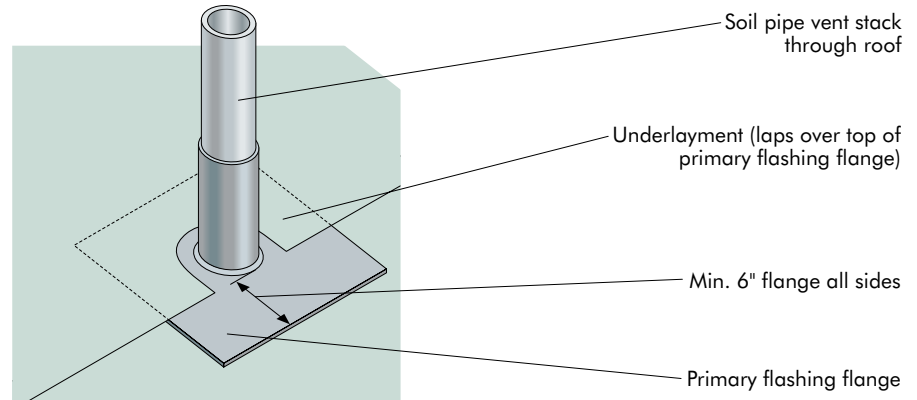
is an illustration of a common vent stack penetration using a rubber or soft metal flashing. While the illustration shows a high-profile tile being used, the general procedure for properly installing the vent pipe flashing is the same for all roofing material types.
